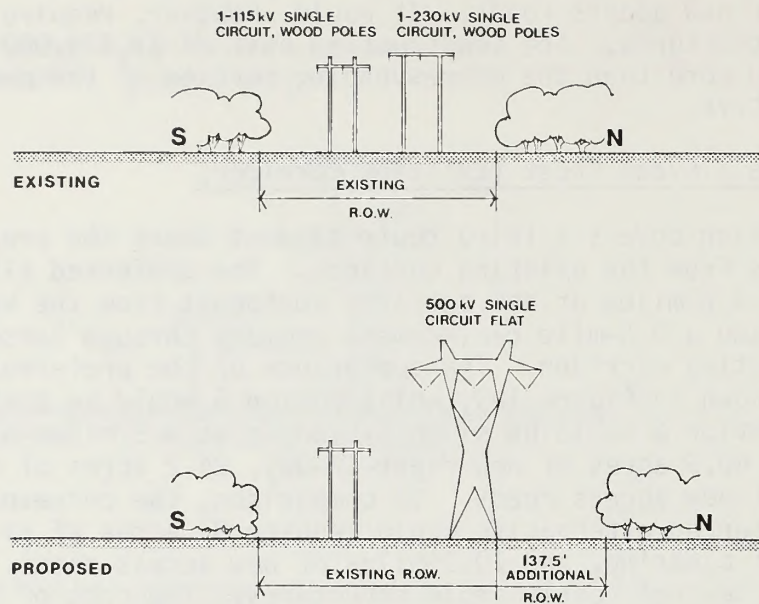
TYPICAL CORRIDORS FOR TABLE ROCK SWITCHING STATION - WHITE CITY SUBSTATION SECTION OF OPTIONS H AND I (MEDFORD BASIN WEST ROUTE AND EXISTING CORRIDOR)
